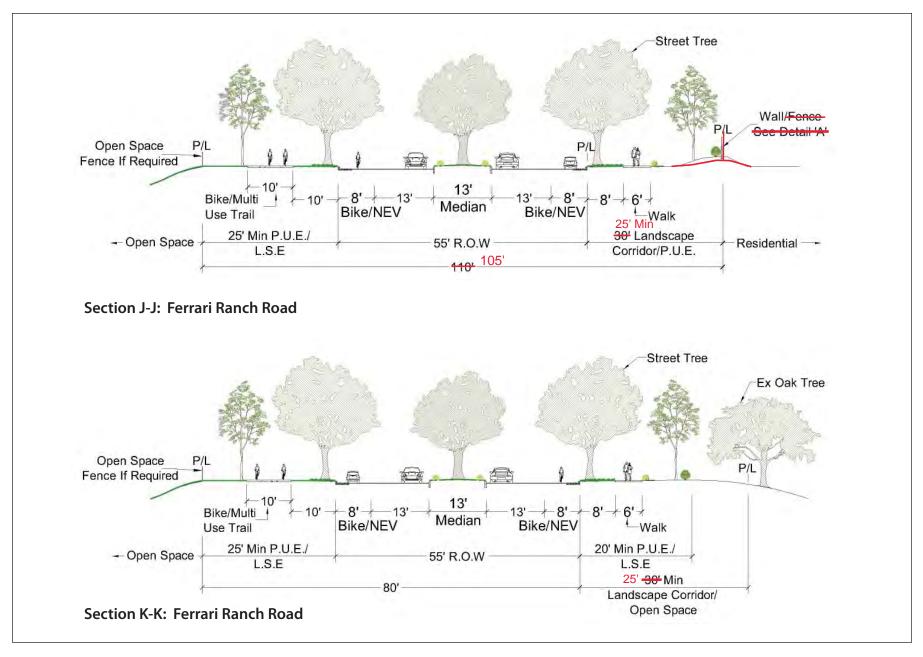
Collector Street Cross Sections - Ferrari Ranch Road
